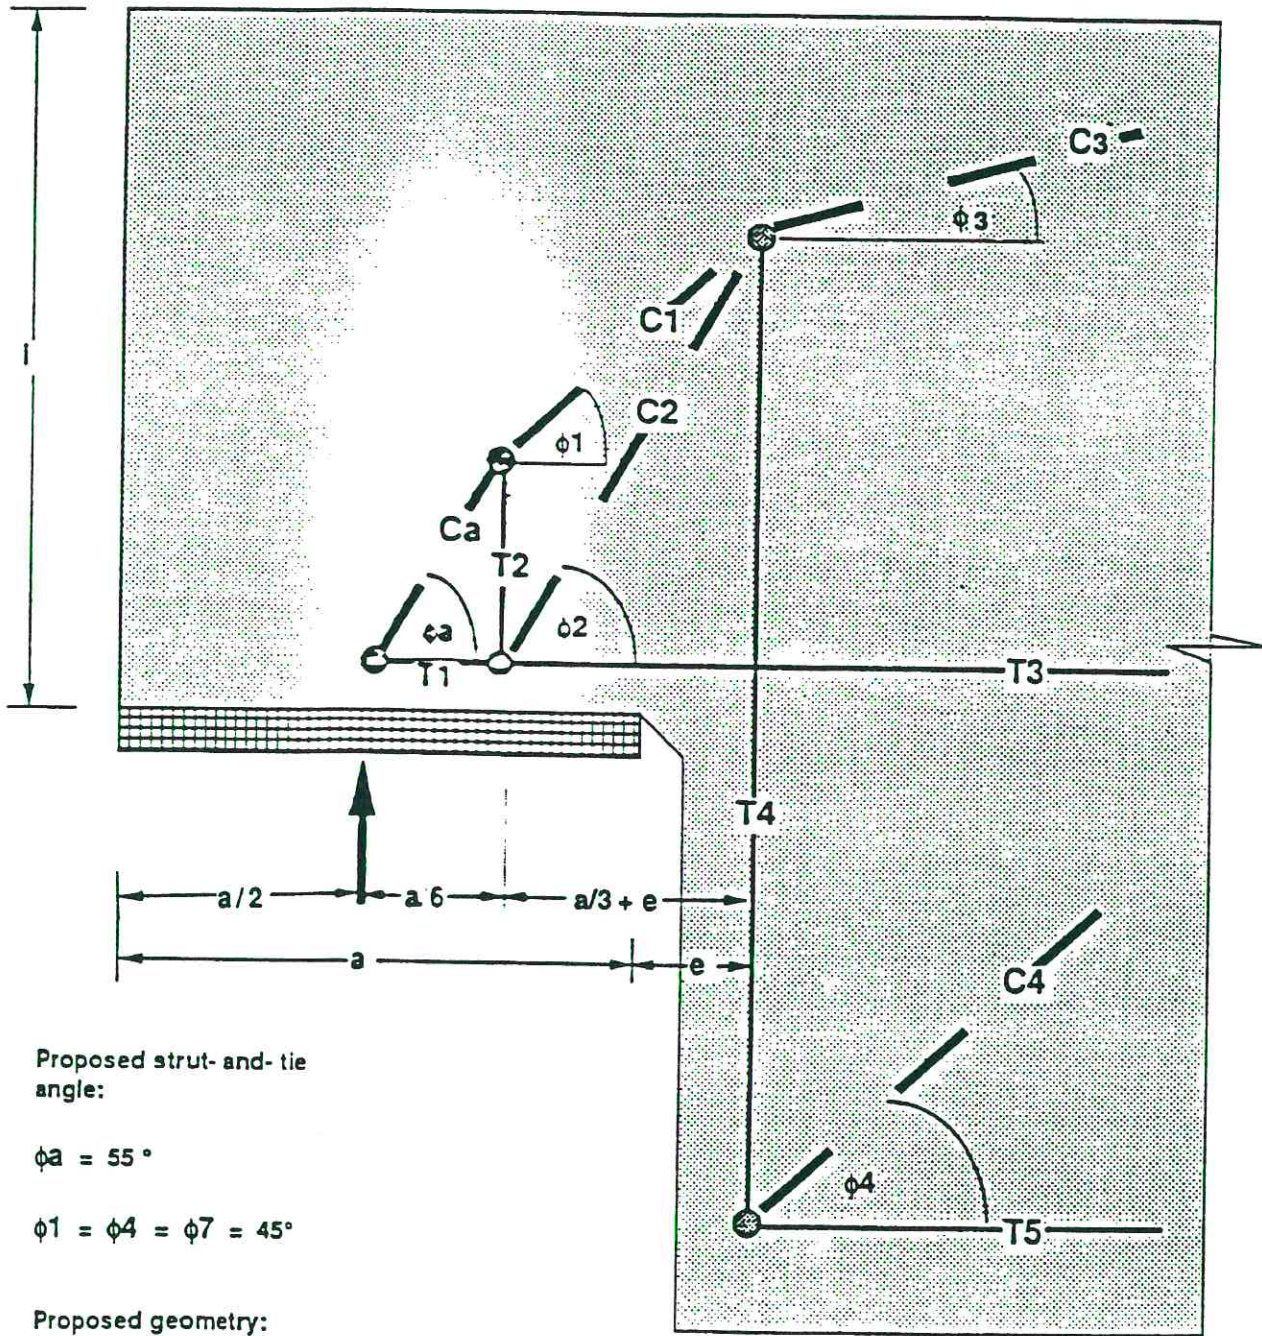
Proposed strut- and- tie- angle for dapped end beam
